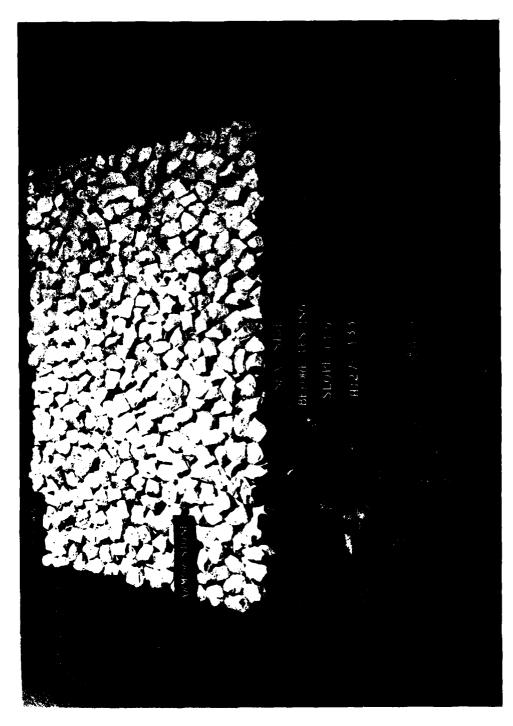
Sea-side view of typical test section before wave attack at a 1:1.5 sea-side structure slope
